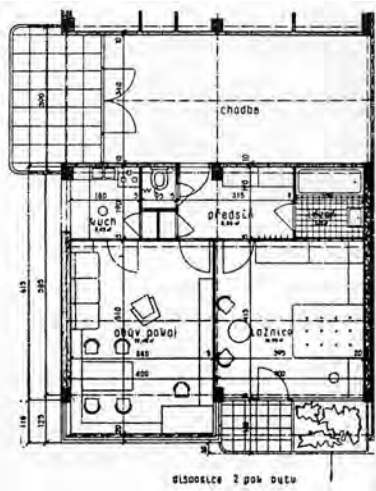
COLLECTIVE HOUSE, LITVÍNOV, TWO-ROOM UNIT PLAN.
